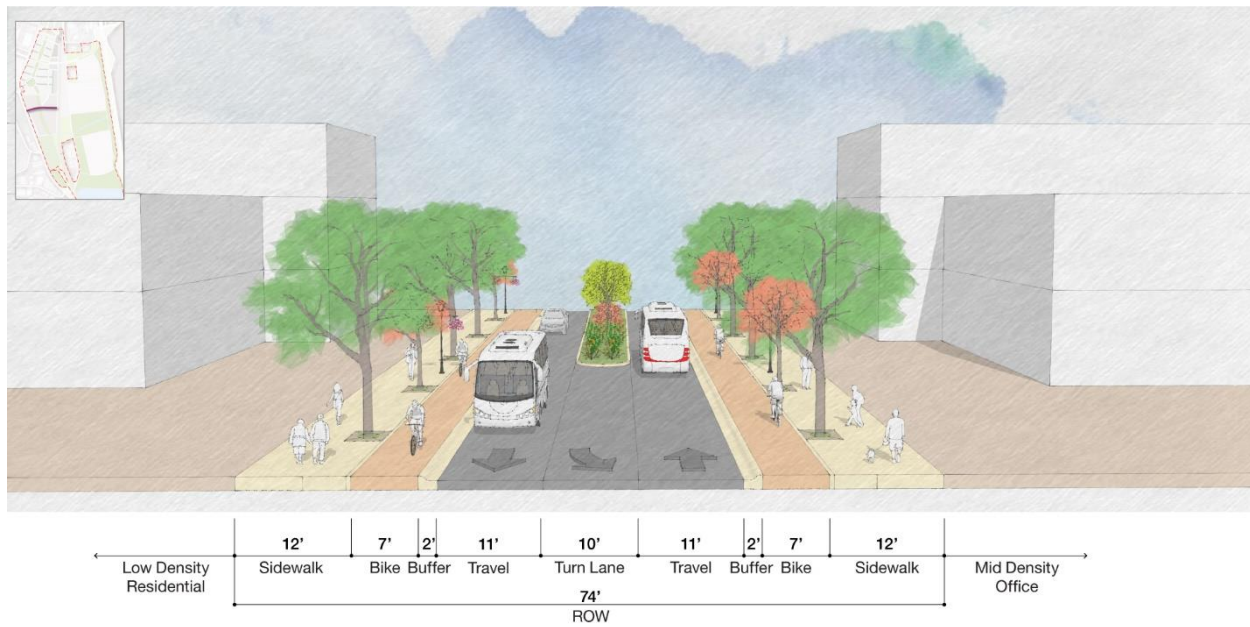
Main Street Proposed Cross-SectionFigure 3-22: Campus Parkway Proposed Cross-Section
